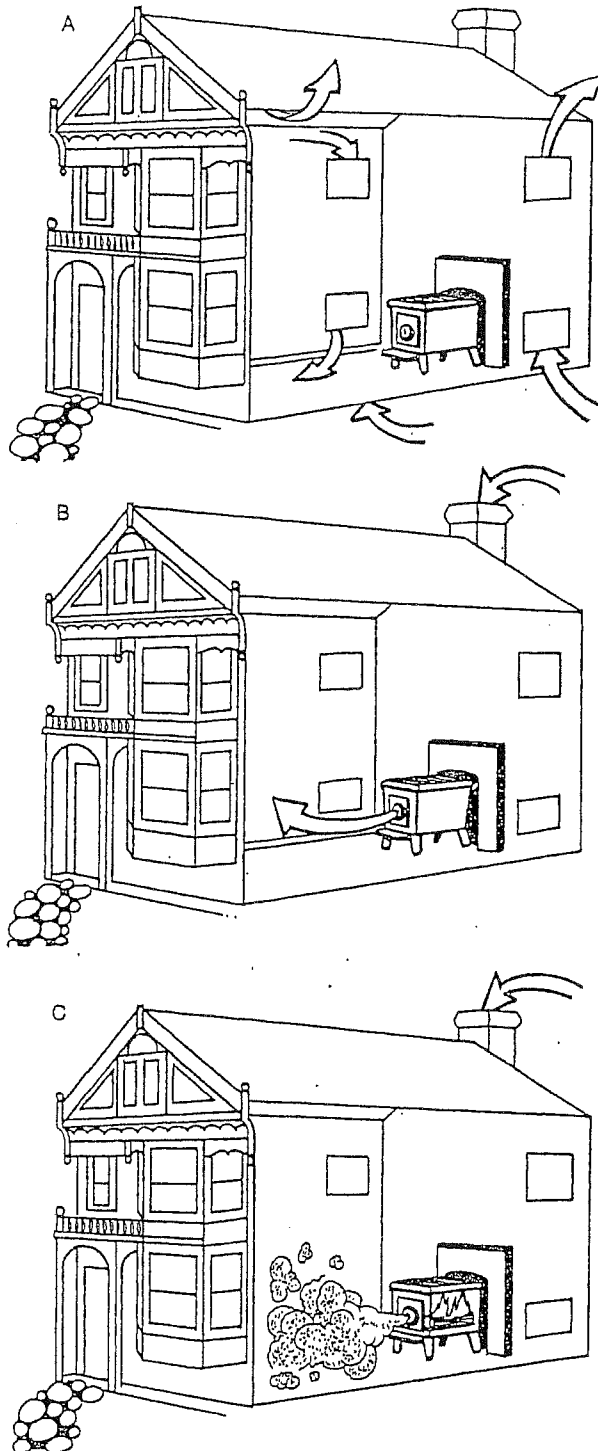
Exterior chimneys in multistory houses often have poor draft. A: The normal air flow into and out of a house on a calm winter day. The air tends to be drawn into the house on the ground floor. B: As a result, many exterior chimneys are non-self-starting; air flows down the chimney when it is cold. C: Even when the chimney is in use, smoke can become sufficiently cool that flow reversal occurs.
